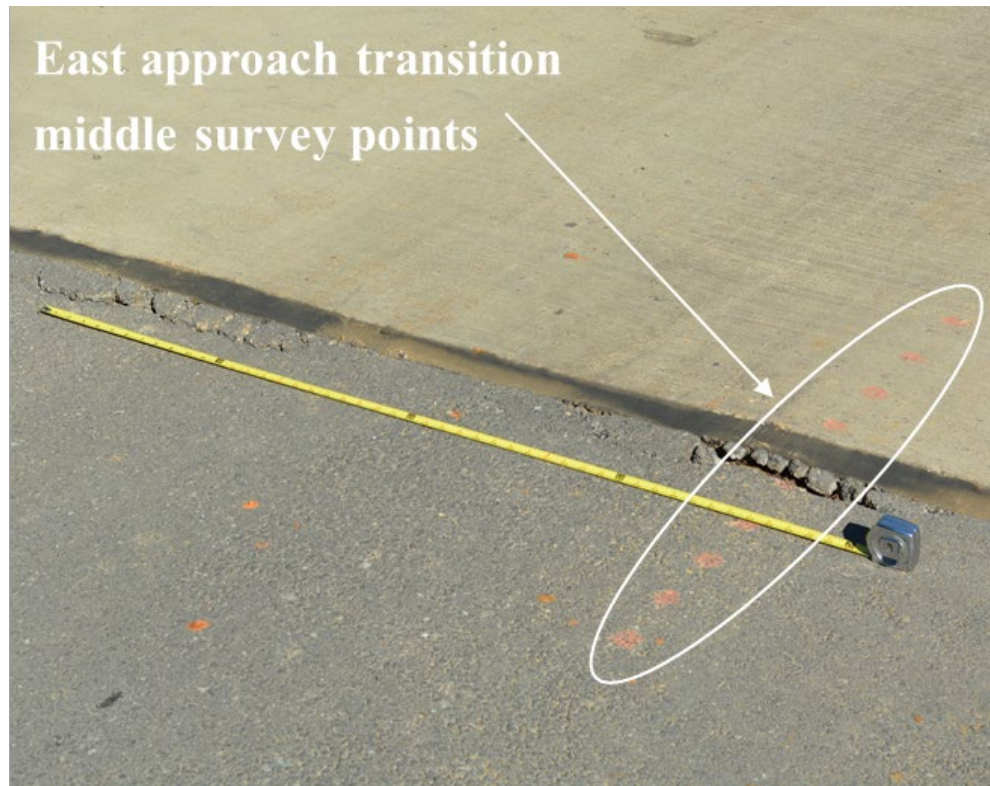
Photograph of bump at the end of Mack Creek Bridge and survey points on east approach centerline
